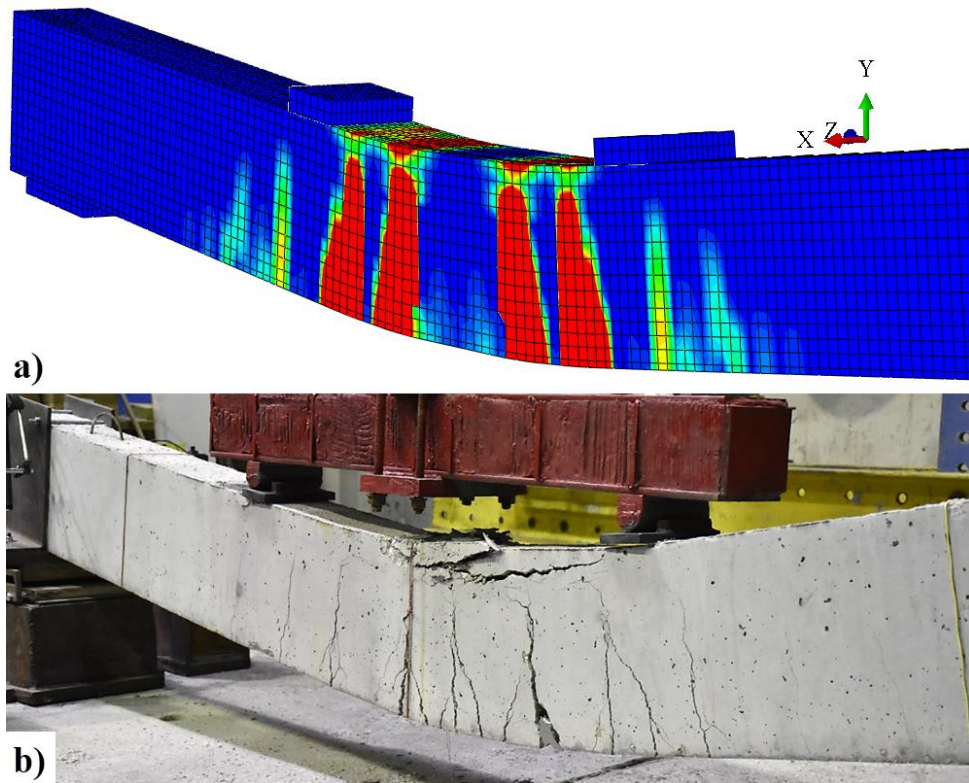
(a) Numerical (b) and experimental cracking along the cross-section of the unstrengthened RC beam (specimen RC_AT) at the failure instant: perspective view
